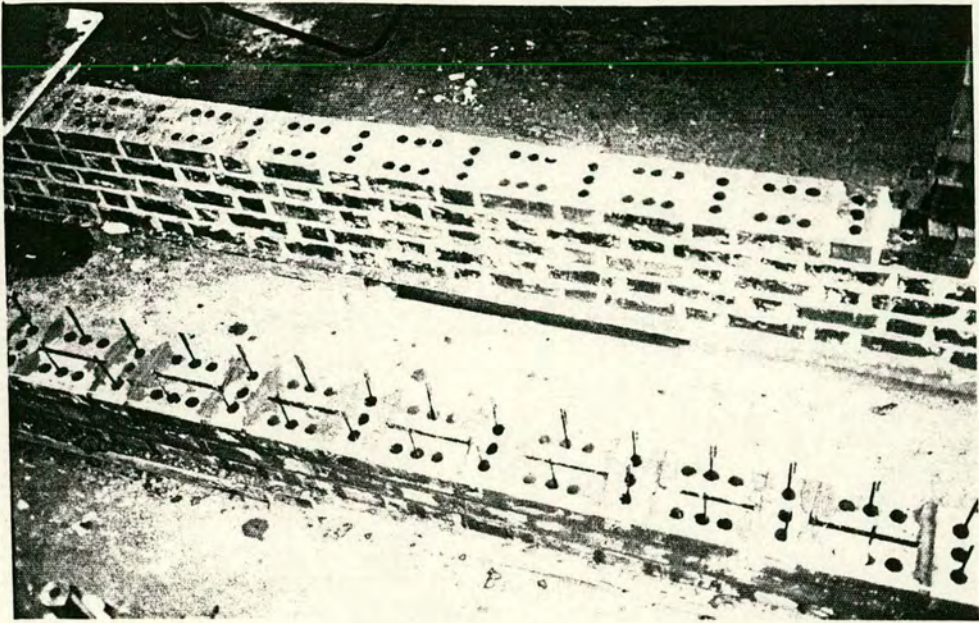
Flemish bond beams under construction (B1-B2)
